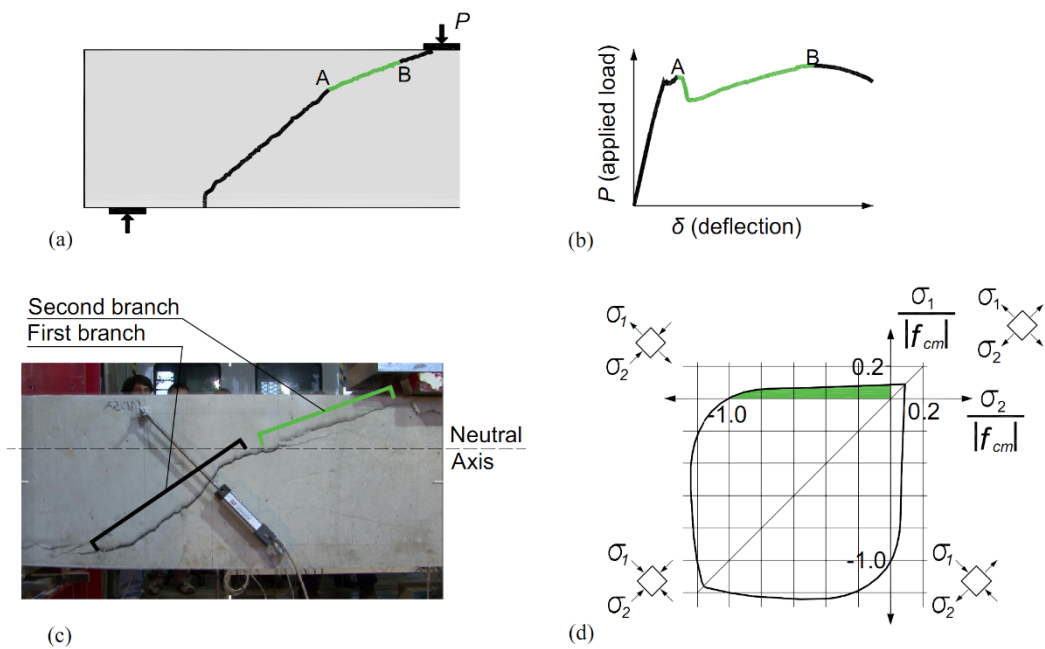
Critical shear crack propagation: a) qualitative scheme of crack trajectory; b) schematic load-displacement curve; c) critical crack in a tested beam; d) adopted failure envelope for concrete under biaxial stress state.
